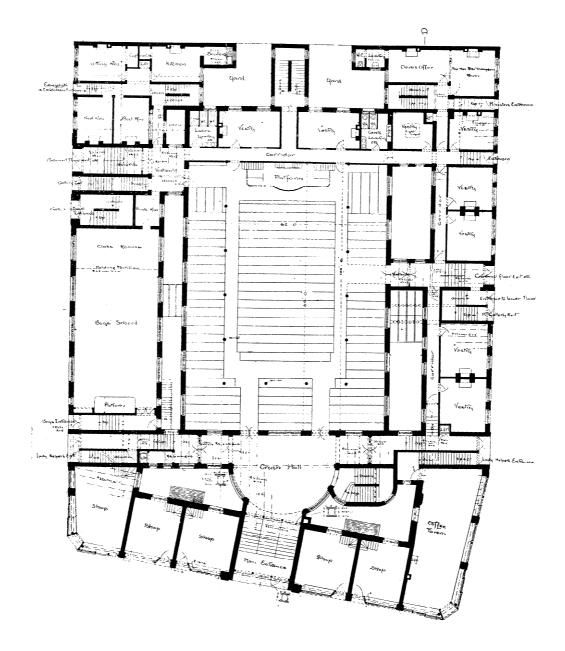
Ground floor plan of the East End Mission in Stepney by Weir, Burrows and Weir (1907). Source: WCCAR 1907.
